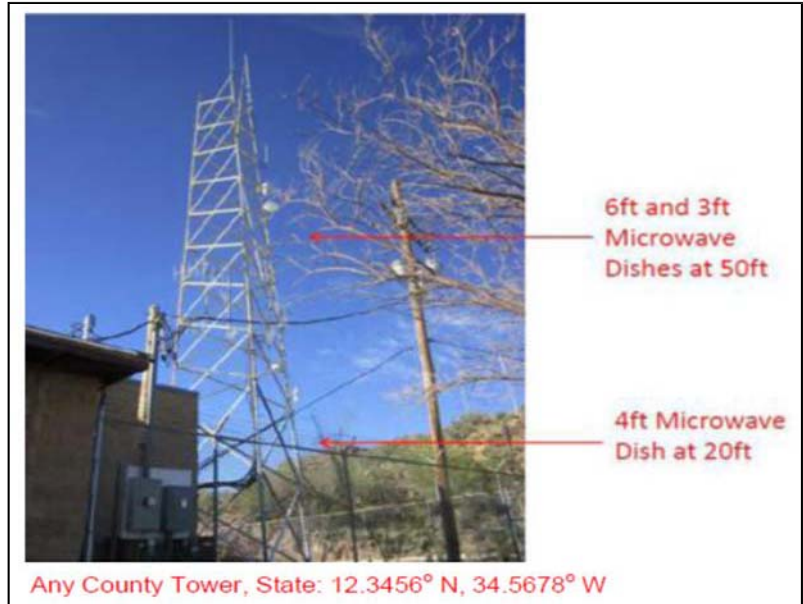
Ground-level photograph showing proposed locations of new communications equipment on an existing tower.
